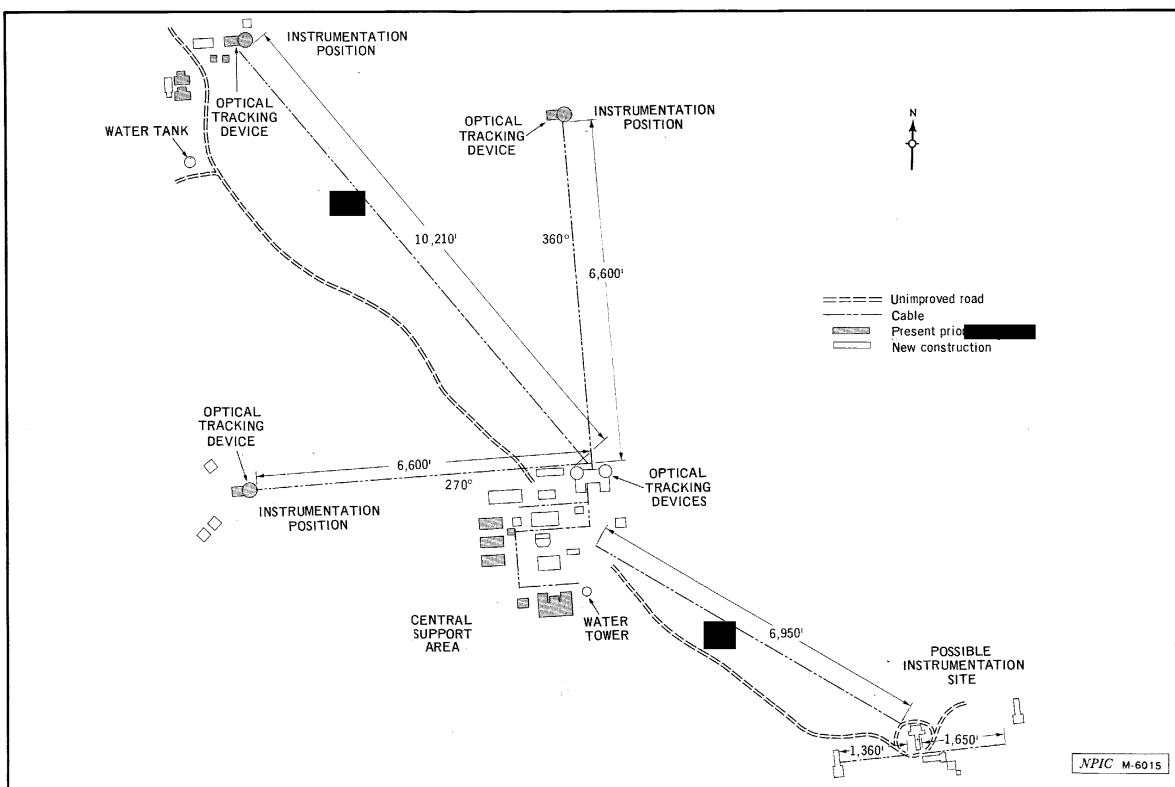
LAYOUT OF SSM TRACKING FACILITY 18.
